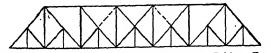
H Petit Truss with Sub-struts and Parallel Chords (Baltimore Truss).
